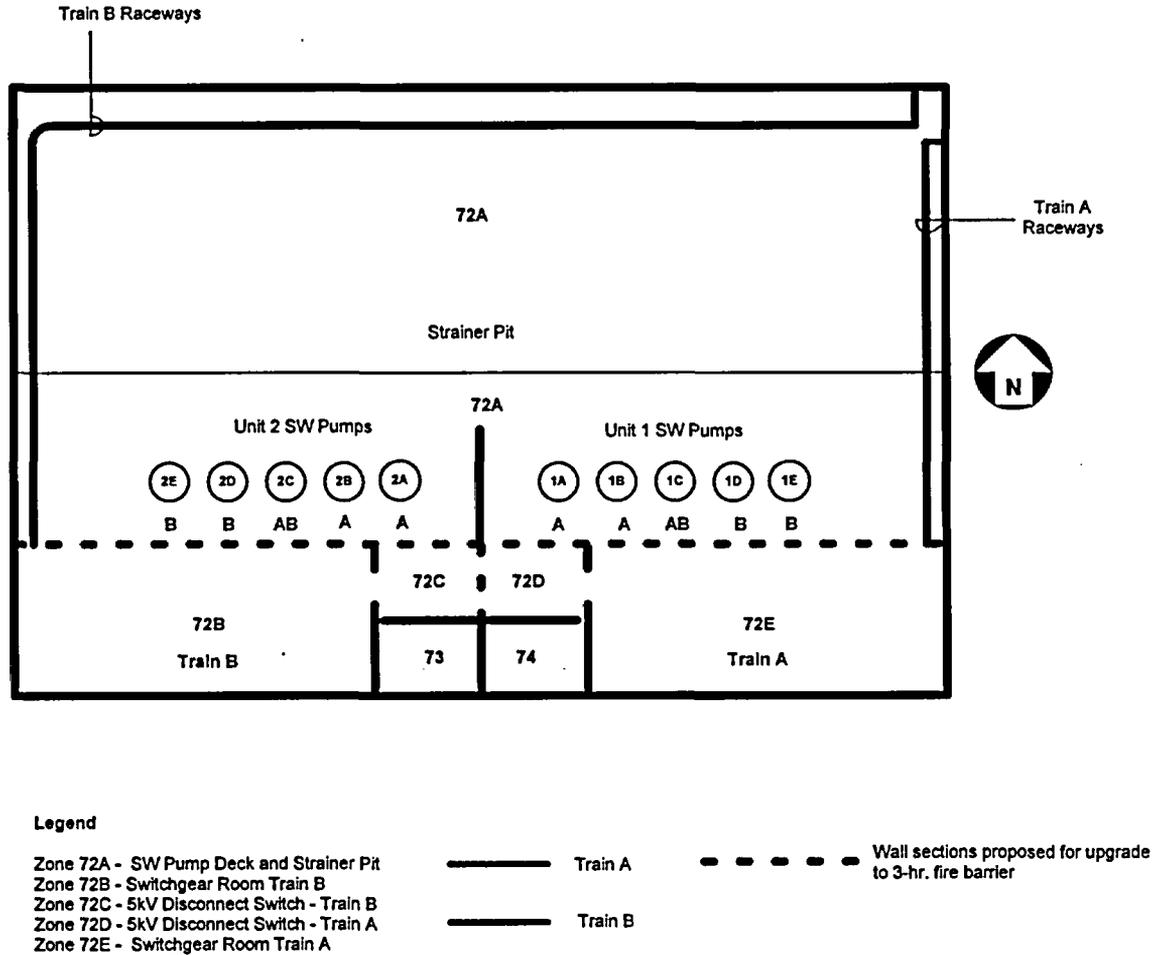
Fire Area 72 – Service Water Intake Structure Simplified Layout (Not to scale)
